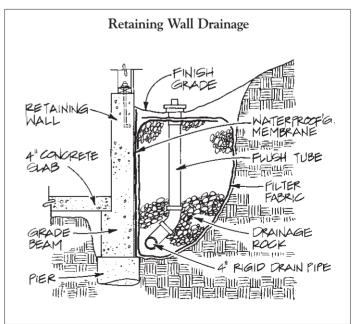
The area behind a retaining wall should be filled with drain rock along its entire length and height to a thickness of at least 2 feet. Joints in rigid 4-inch-diameter drain pipe should be glued tightly, and filter fabric should envelope the whole assembly.
